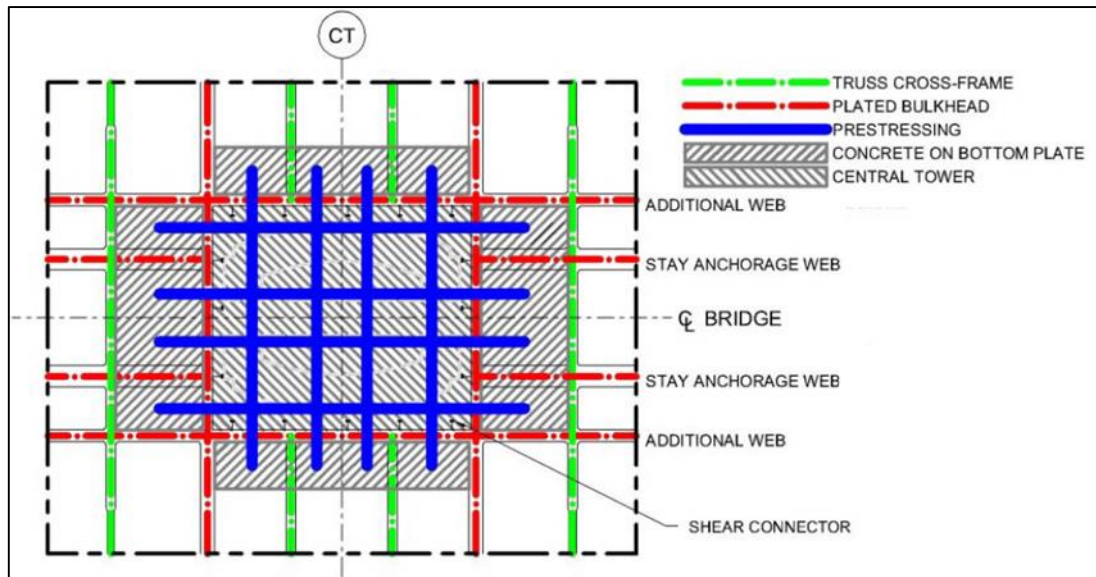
Plan view of the monolithic connection between deck and CT (Kærn, et al., 2017)
